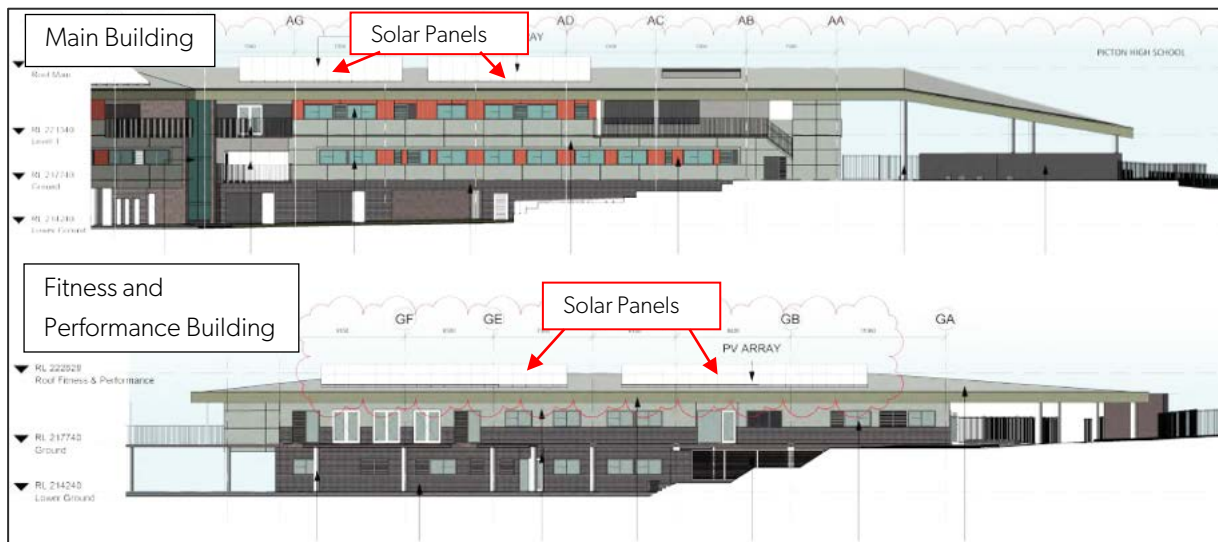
| Proposed solar panels (source: Section 4.55 Modification Application, 2019)
